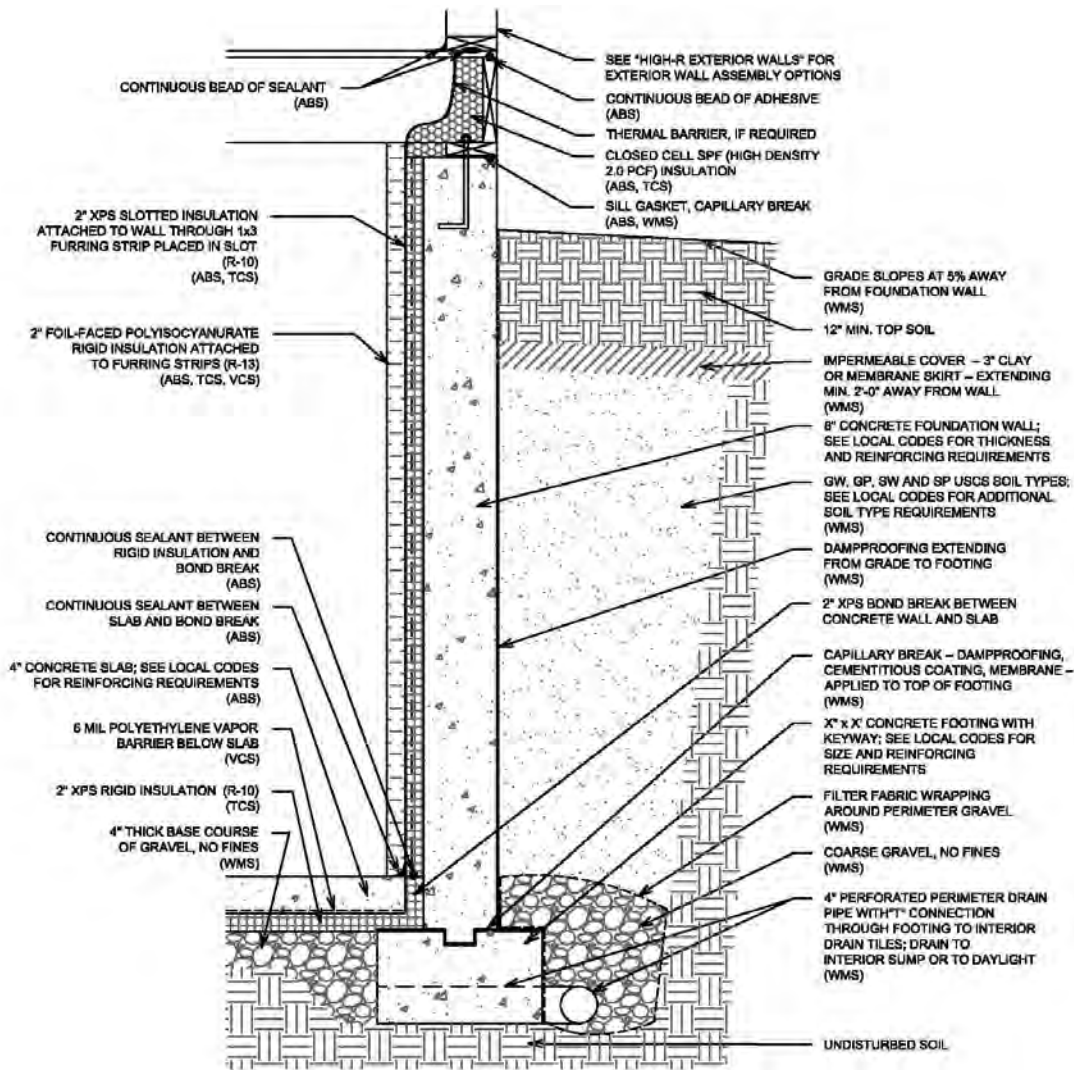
Case 5 Detailed Drawing – Recommended Foundation Wall System
